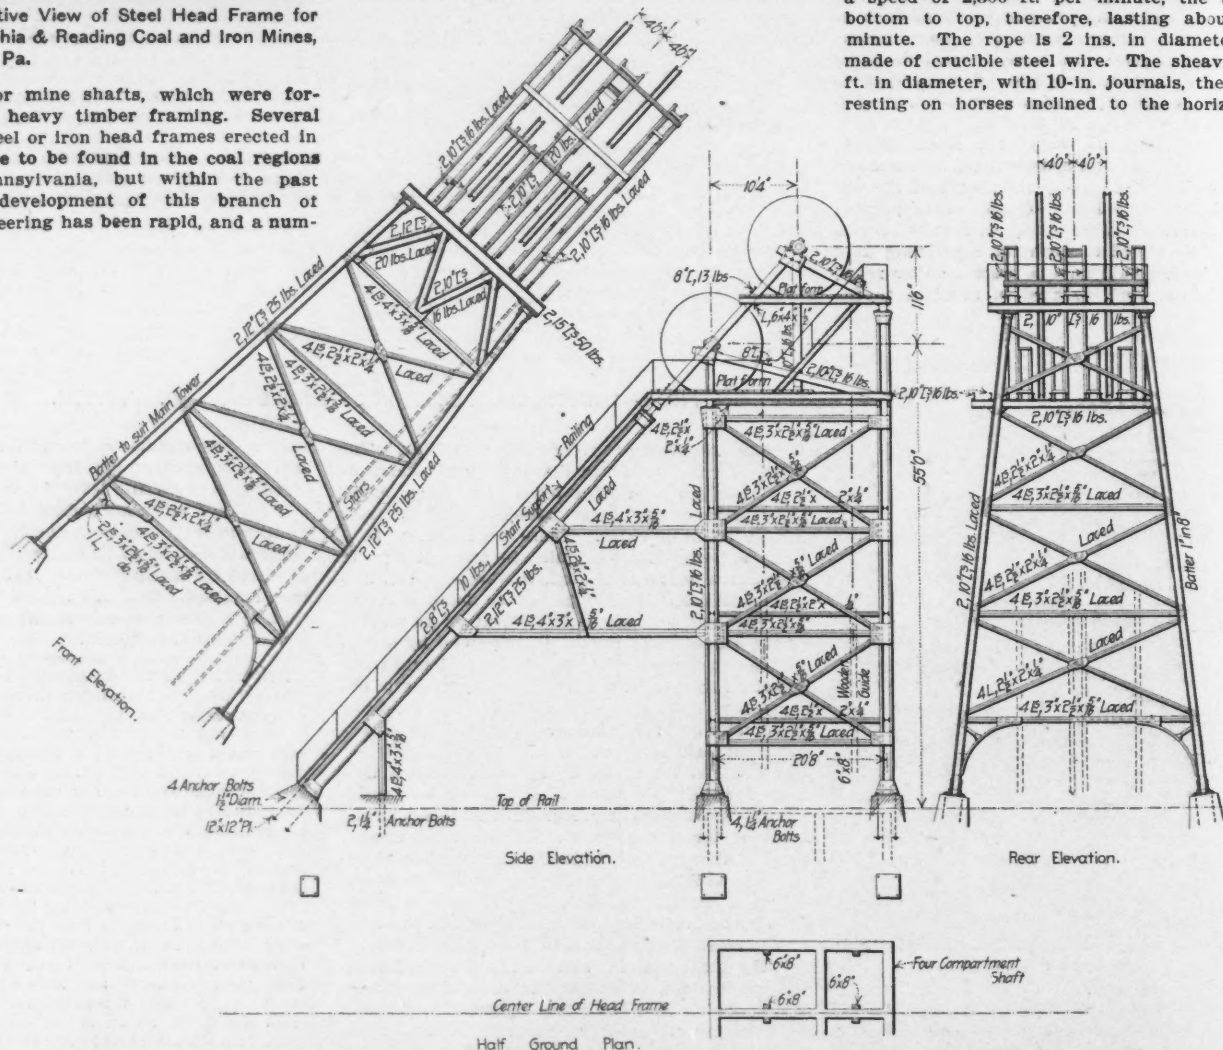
ELEVATION OF STEEL HEAD FRAME FOR THE PHILADELPHIA & READING COAL AND IRON MINES, AT GILBERTON, PA. Pottsville Iron & Steel Co., Builders.
